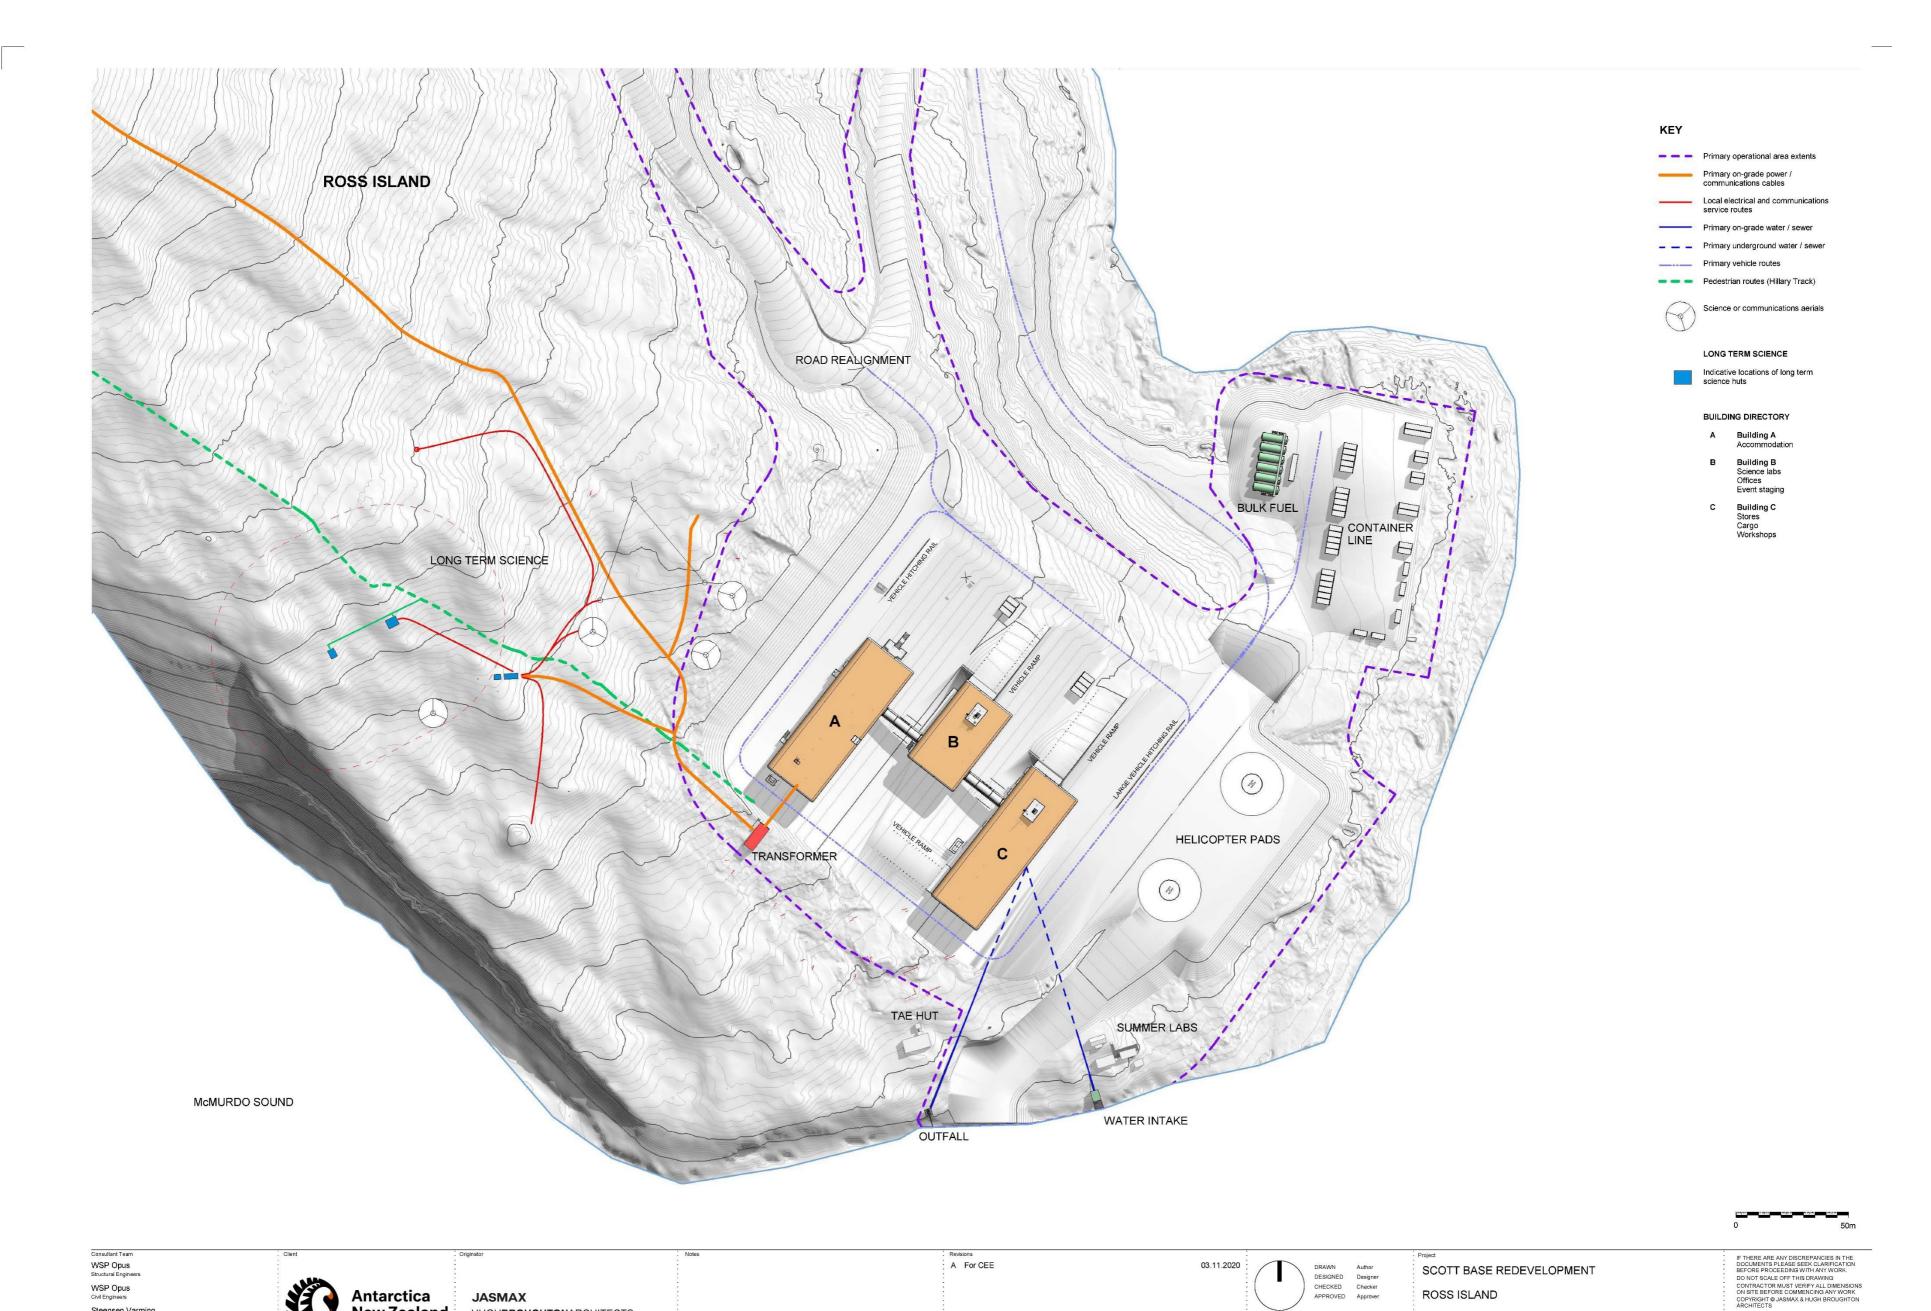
Proposed site layout at Pram Point detailing all services and fuel reticulation.
